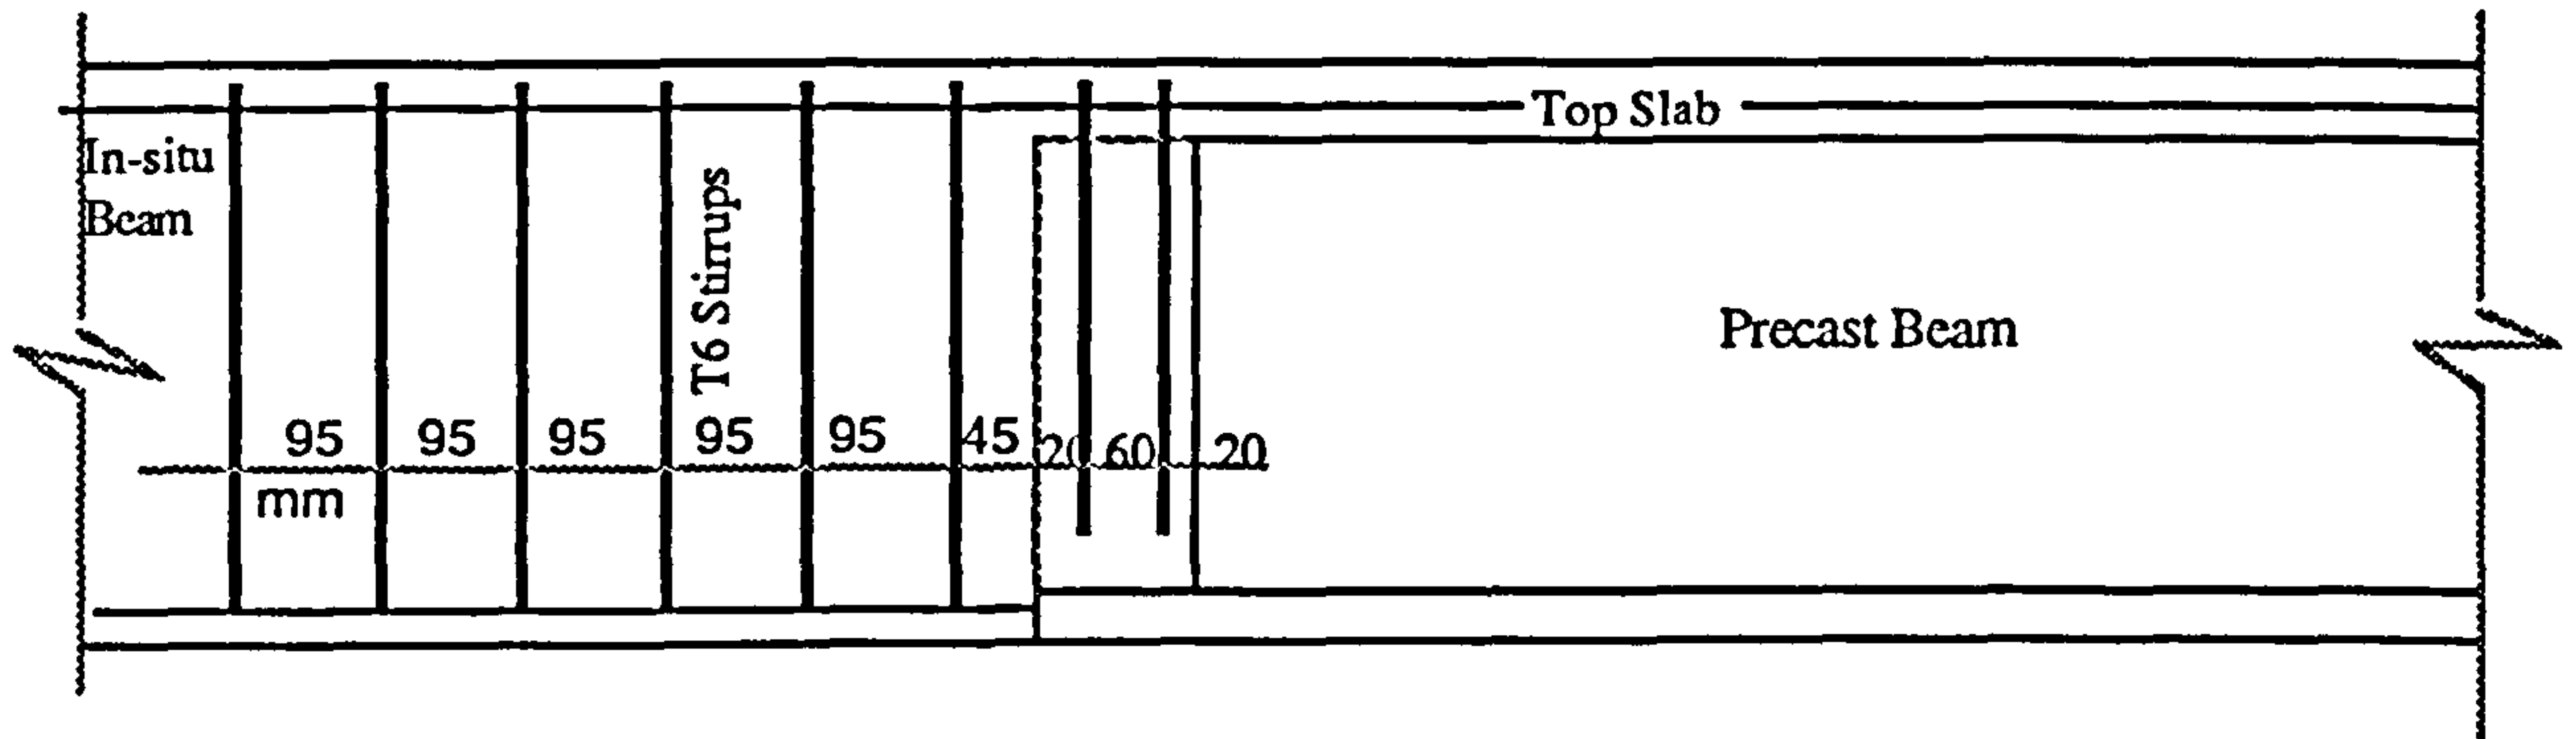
Stirrup Spacings in the In-situ Beam , Tests E10CD7
